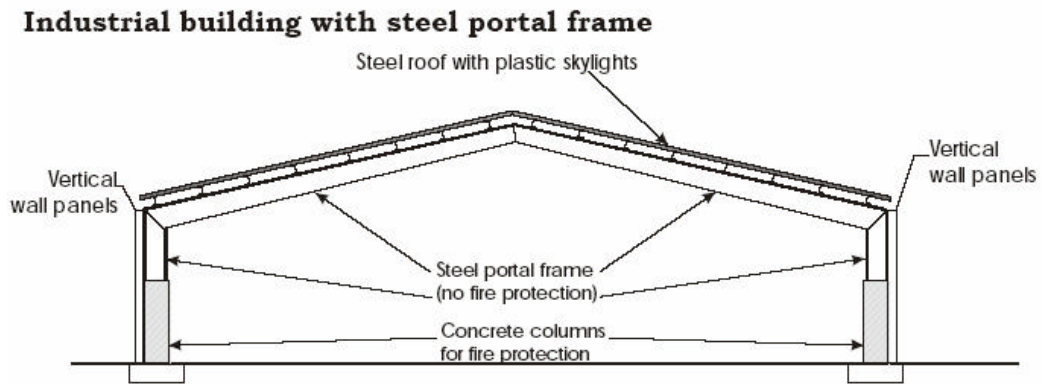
Typical industrial buildings in New Zealand (Lim, 2000)
